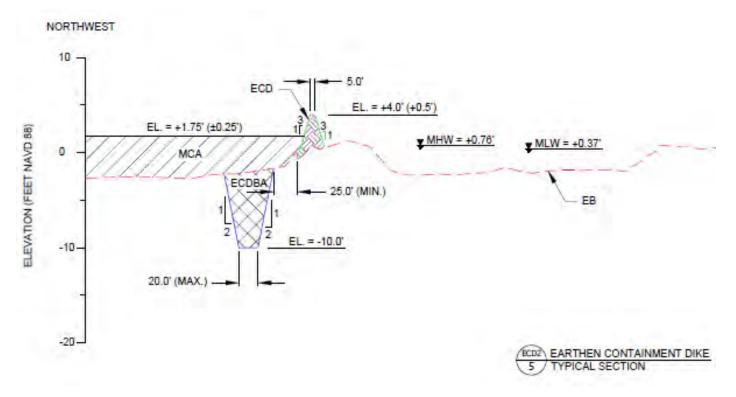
Earthen Containment Dike Typical Cross Section – Interior Borrow
